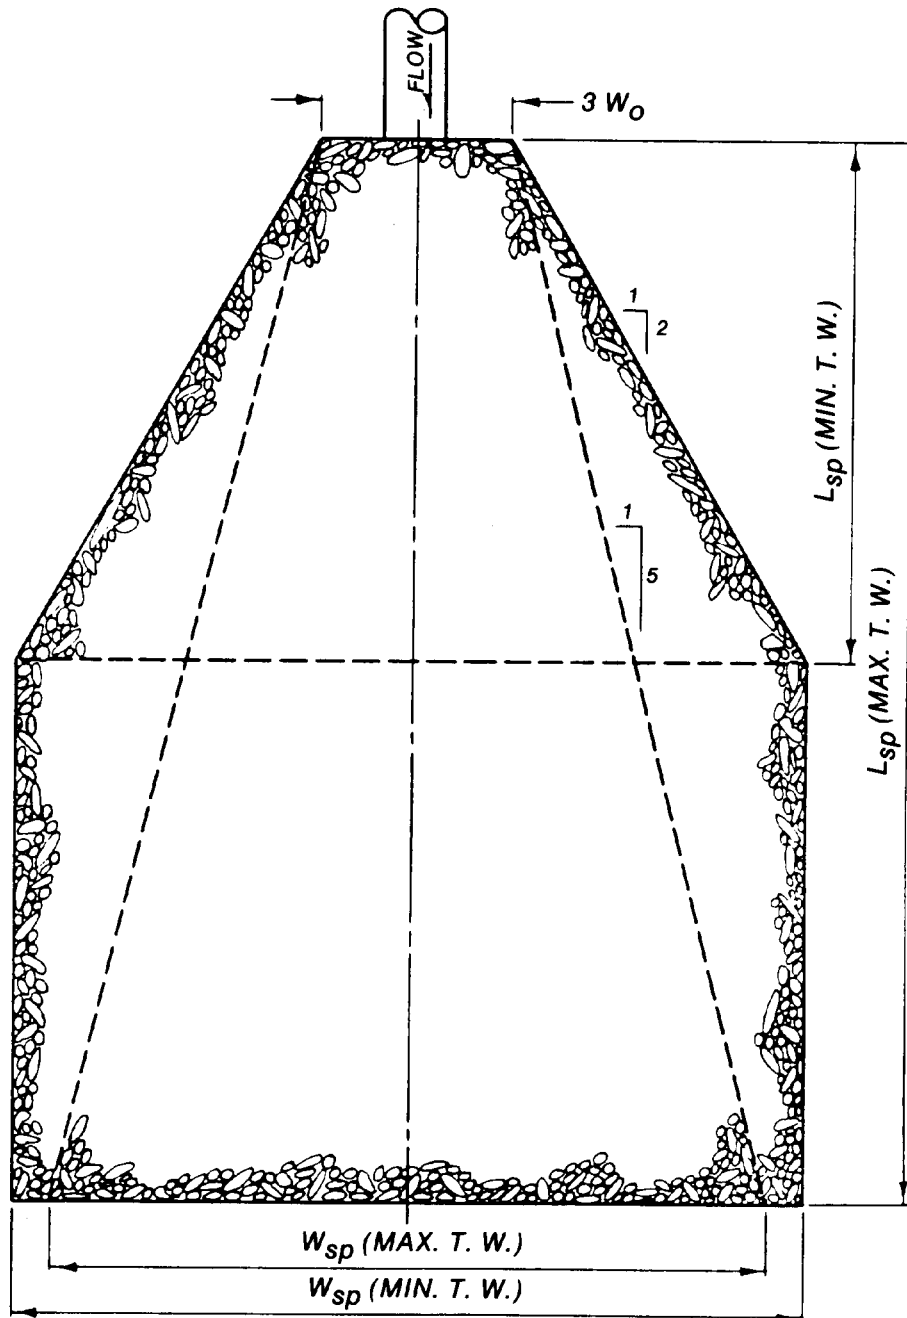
Recommended configuration of riprap blanket subject to minimum and maximum tailwaters.
